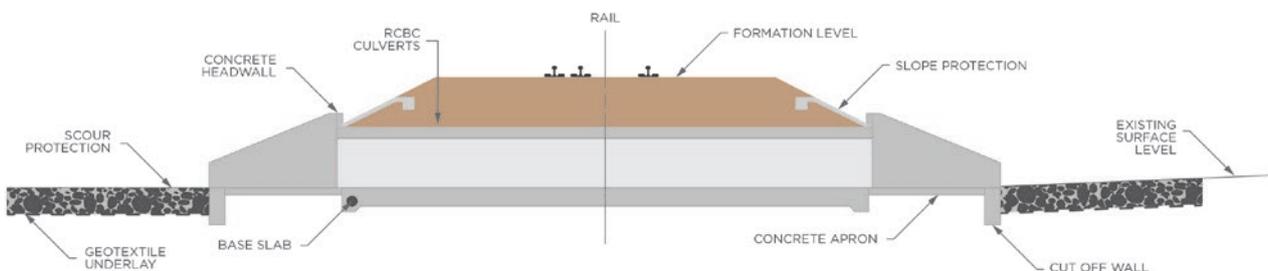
TYPICAL SECTION OF A CROSS-DRAINAGE CULVERT
